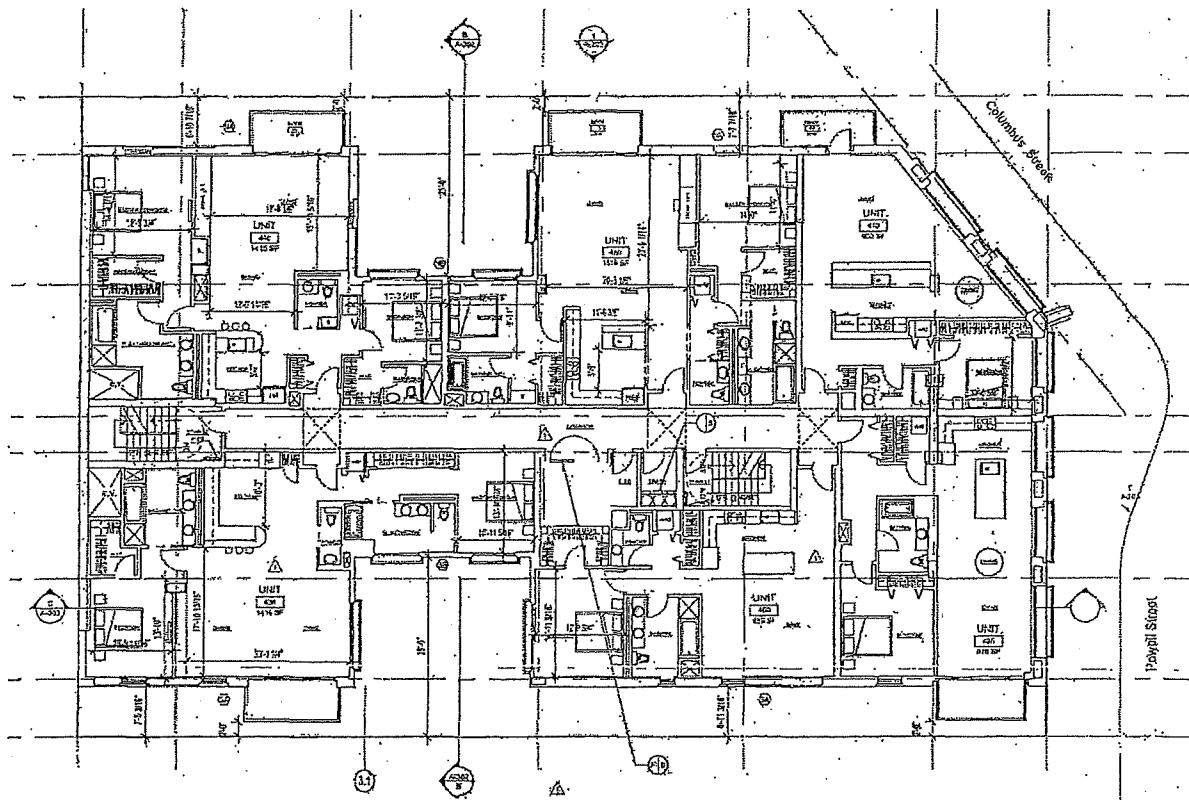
PROPOSED 1731 POWELL ST FOURTH LEVEL PLAN
